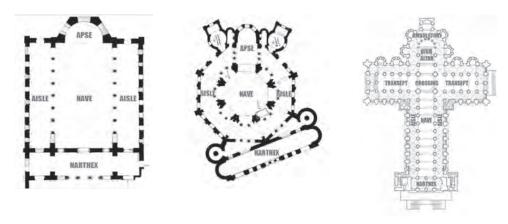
Plan studies, Basilica Plan, Centralized plan, and Gothic church plan.
